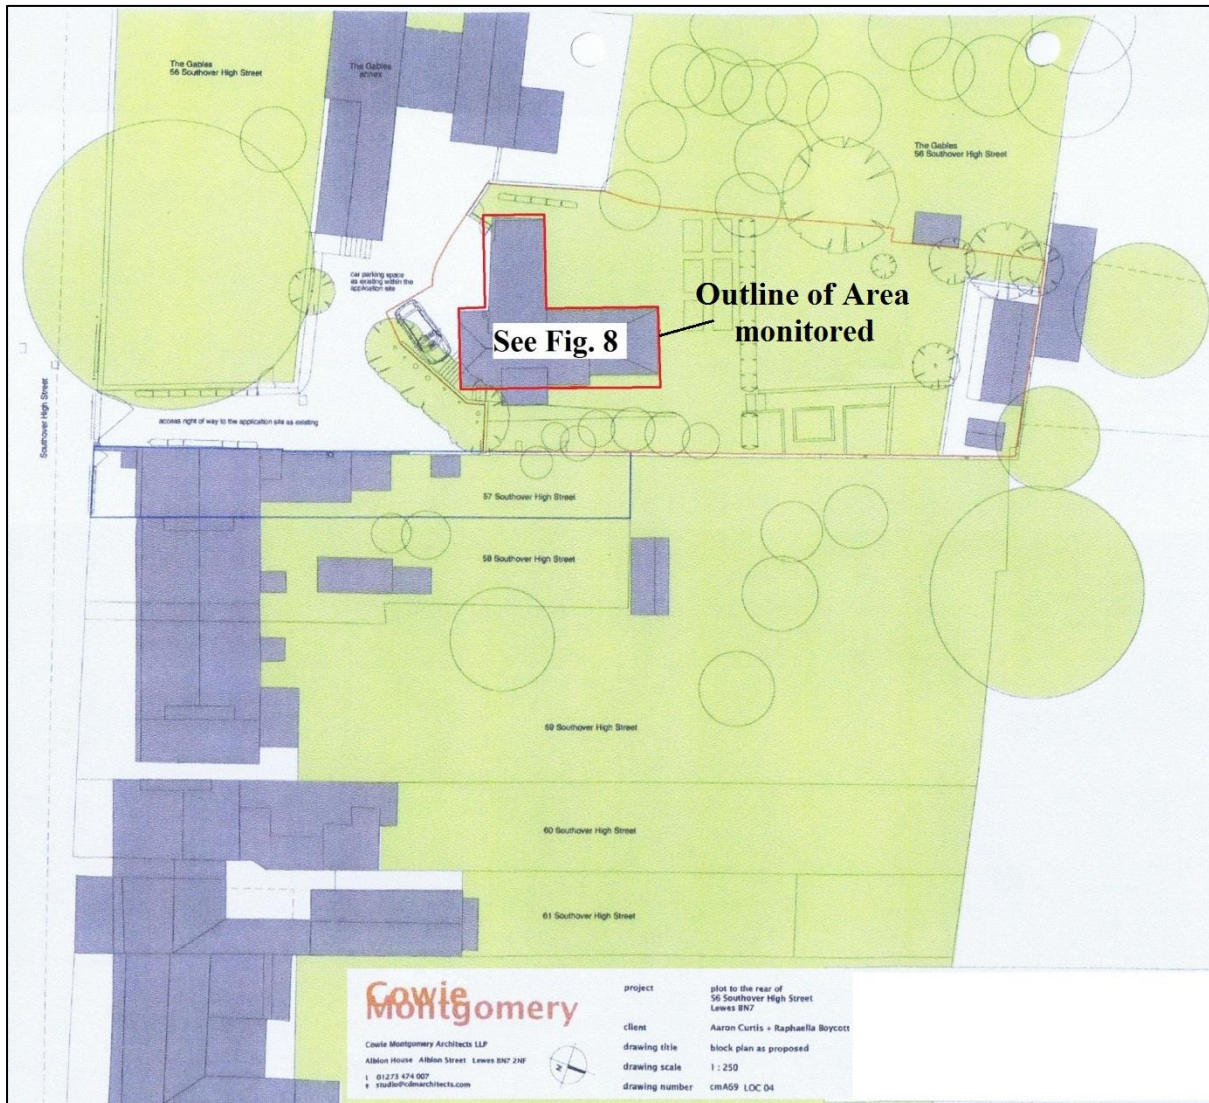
Land at side of 56 Southover High Street, Lewes: Site plan showing the proposed new house (adapted from architects drawing)
